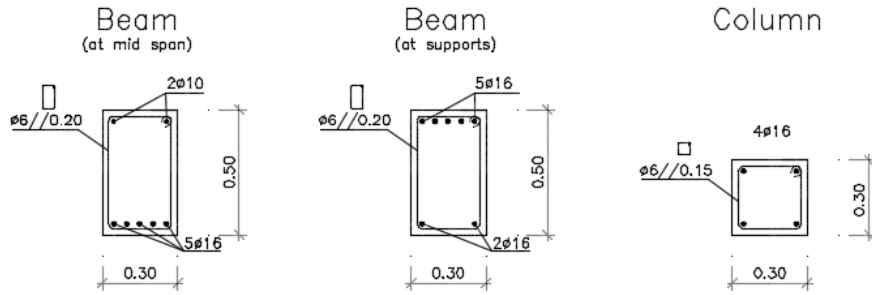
Cross-section and reinforcement scheme of the beams and columns (dimensions in m)
